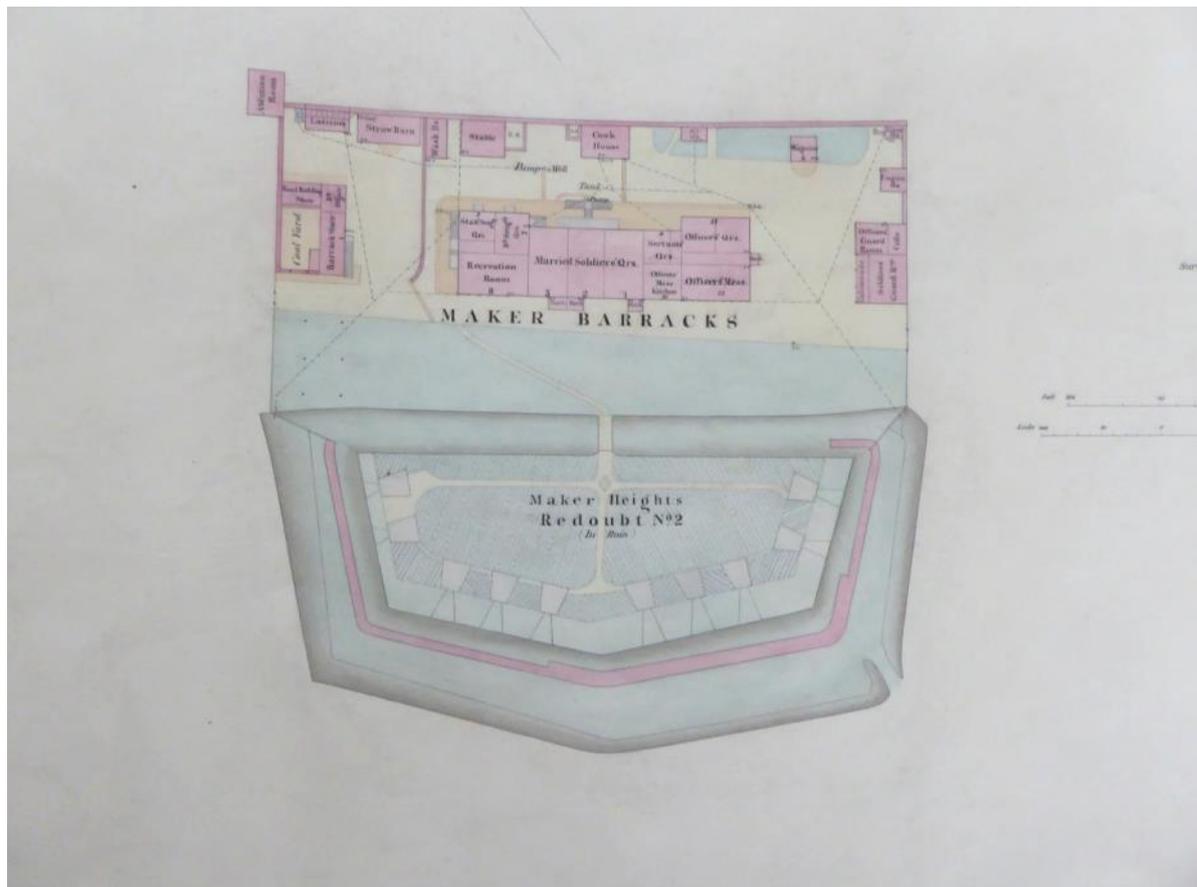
Plan of Barracks and Redoubt No 2 c1865 (National Archives: MPH 1/624/5-6).
